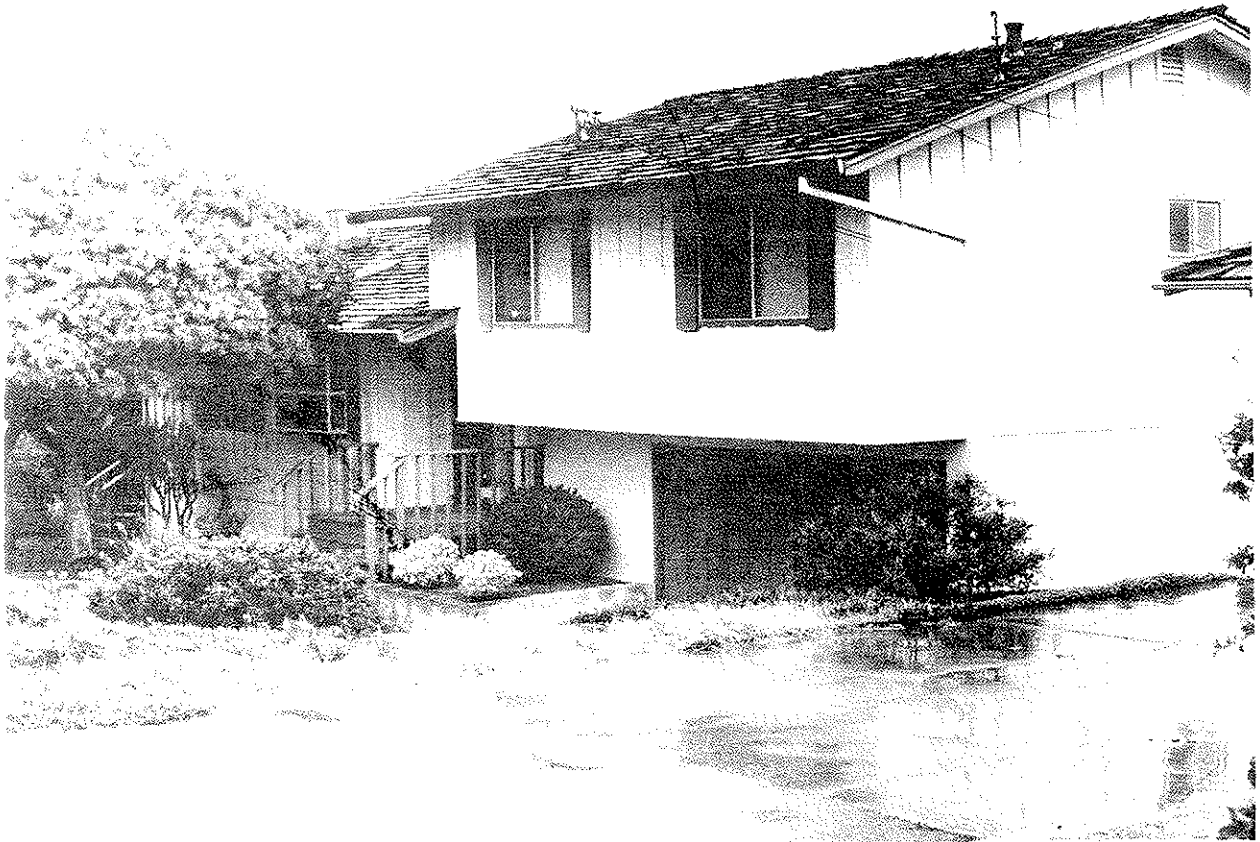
Undamaged split level house located in area of Los Gatos where many older one-story houses slipped laterally off their foundations.
